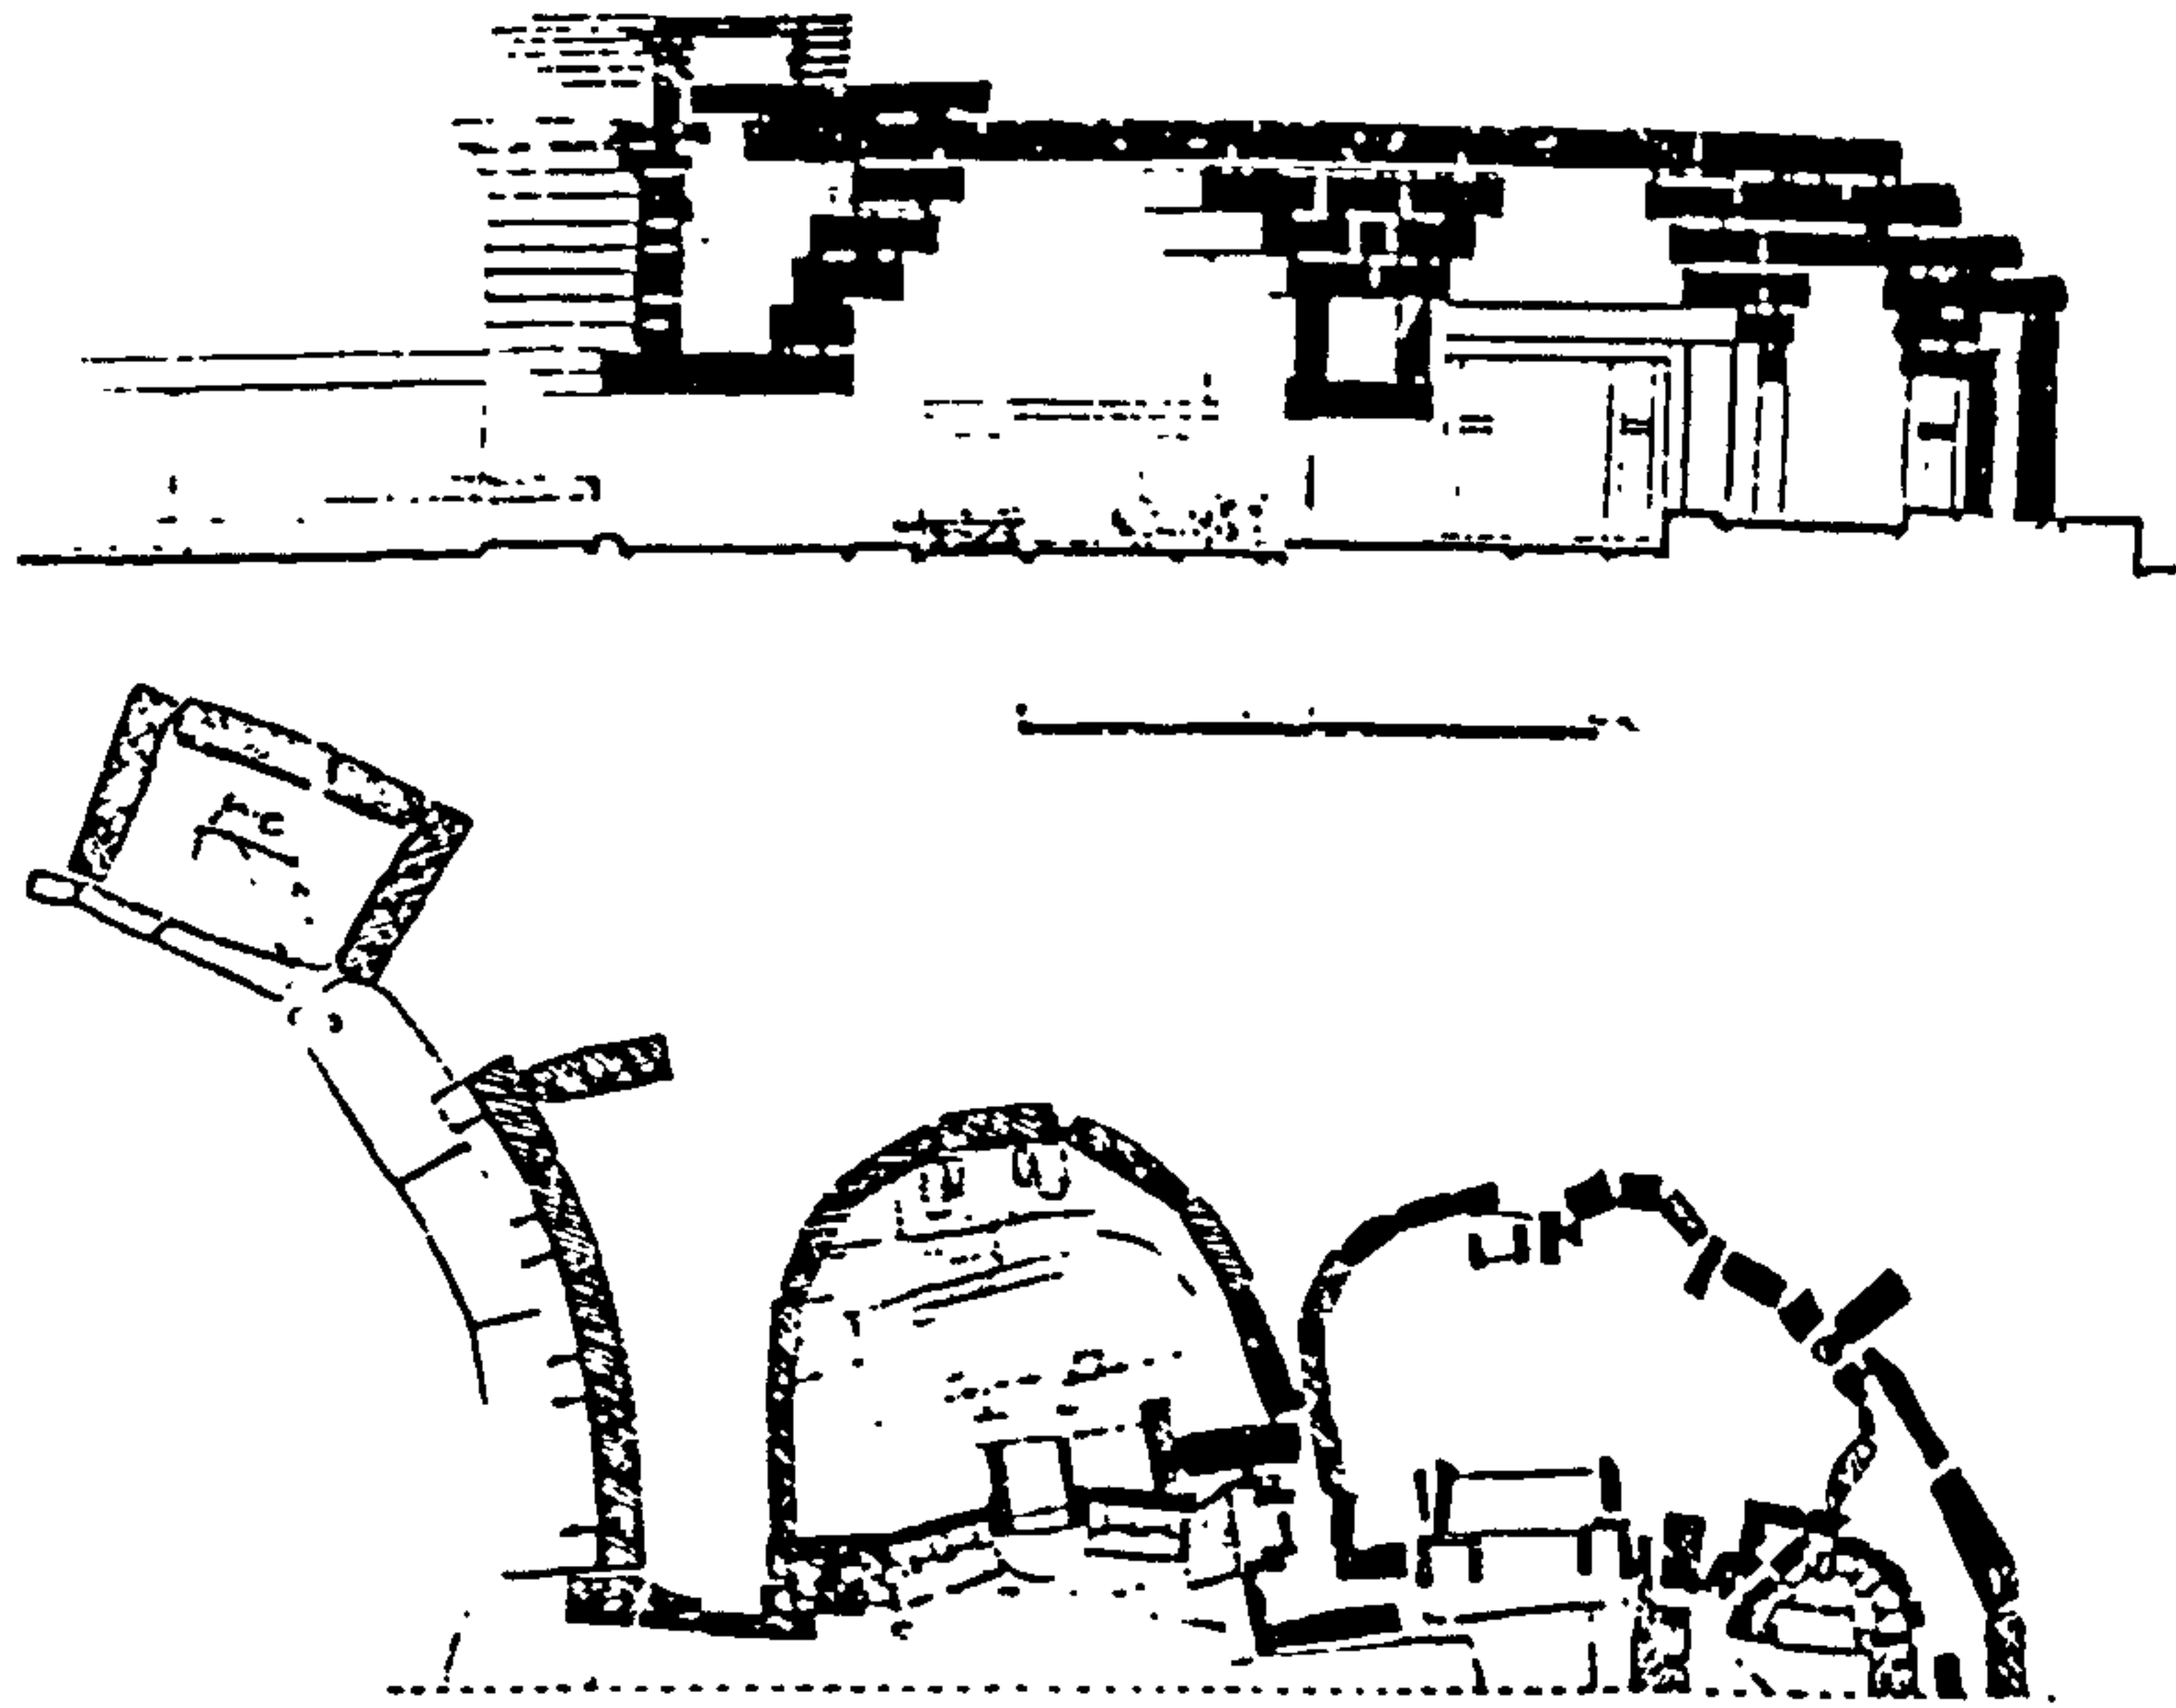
Reconstruction section and plan Temple 1, Tarxien.
